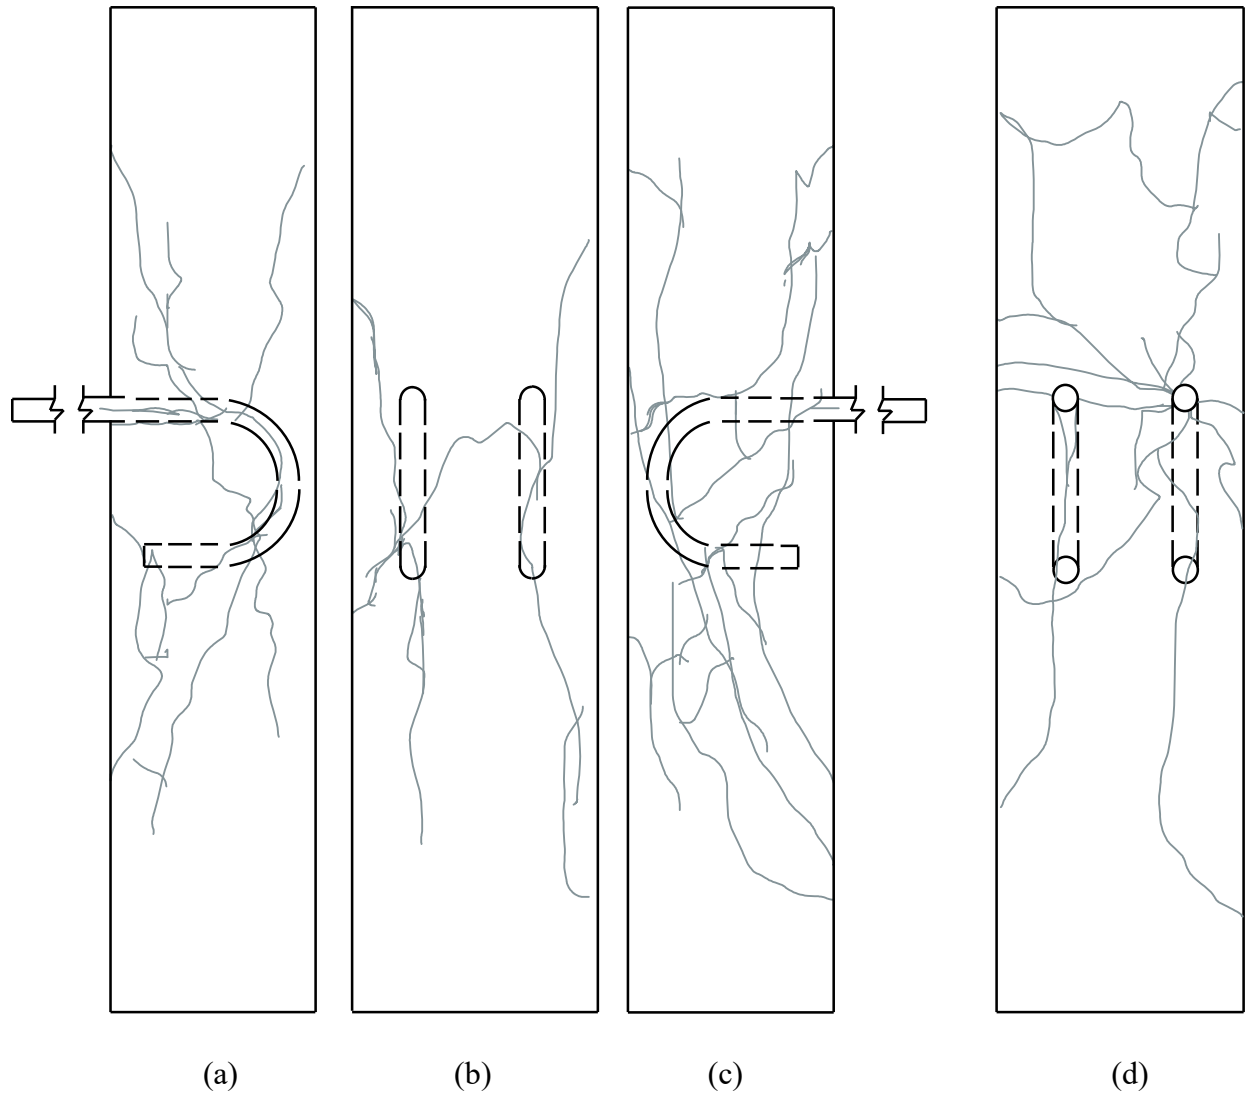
Crack pattern at maximum normalized tensile load for beam-column joint specimen P2-180, which was deemed an outlier: (a) west side face, (b) back face, (c) east side face, and (d) front face
